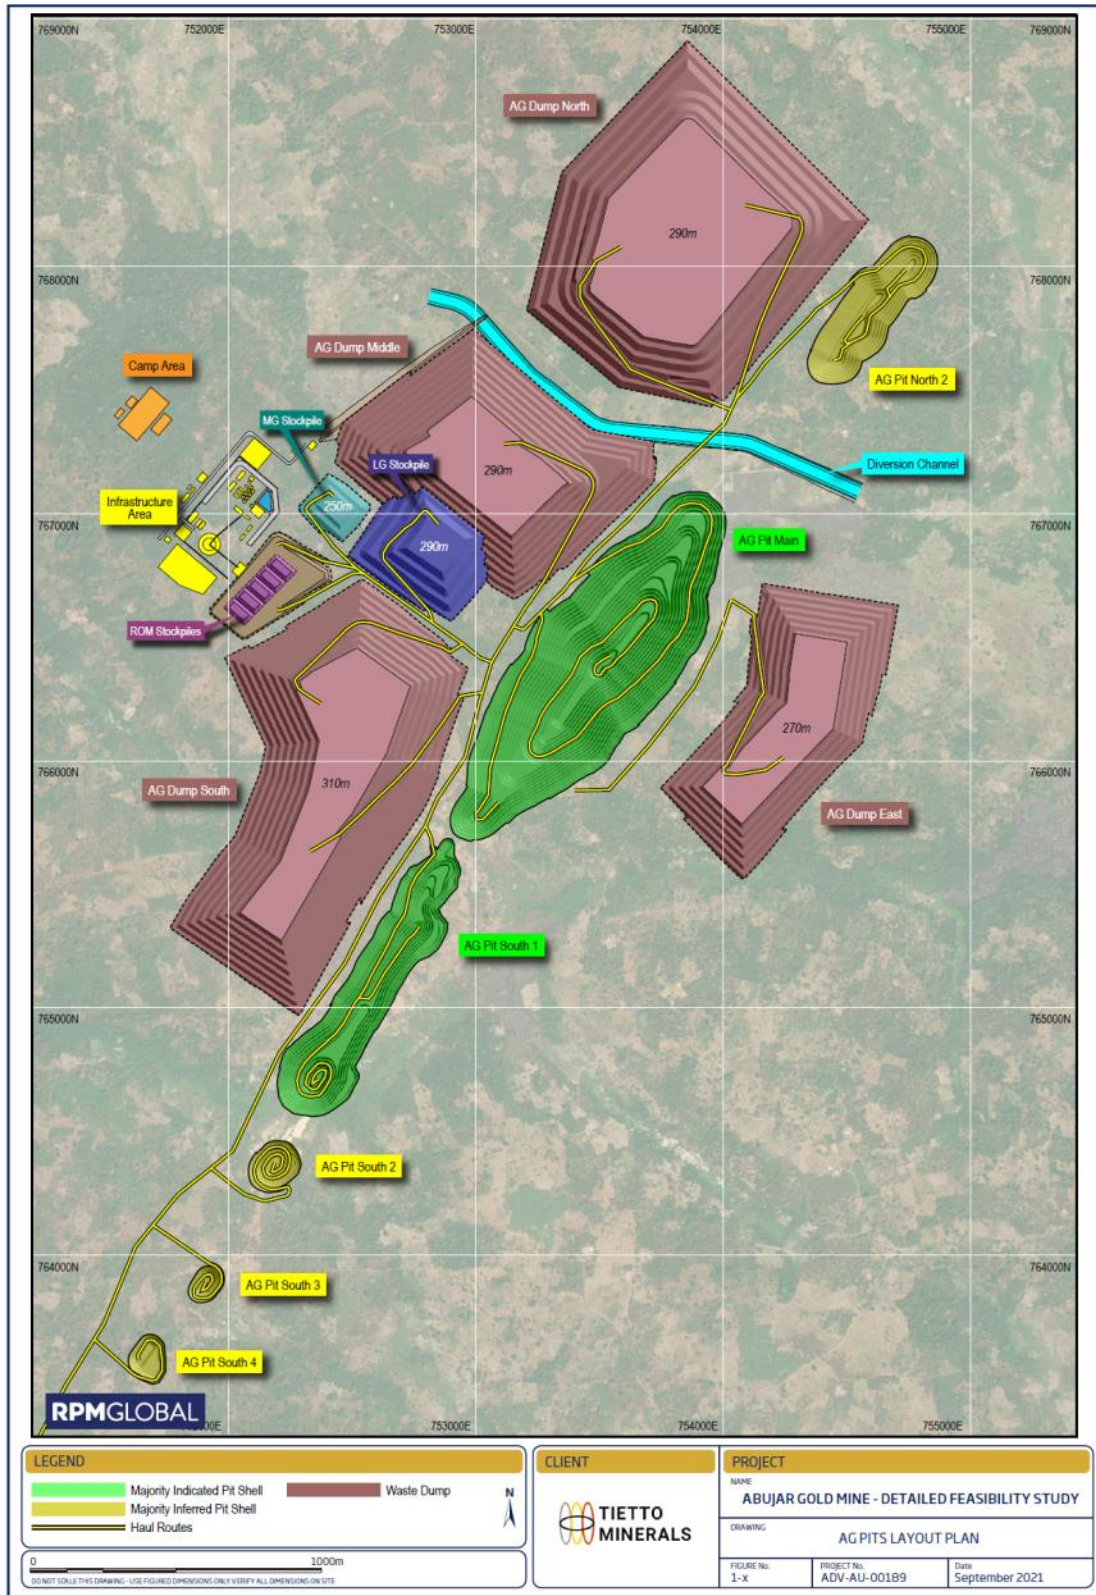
Proposed layout Abujar Gold Project – AG Open Pit
